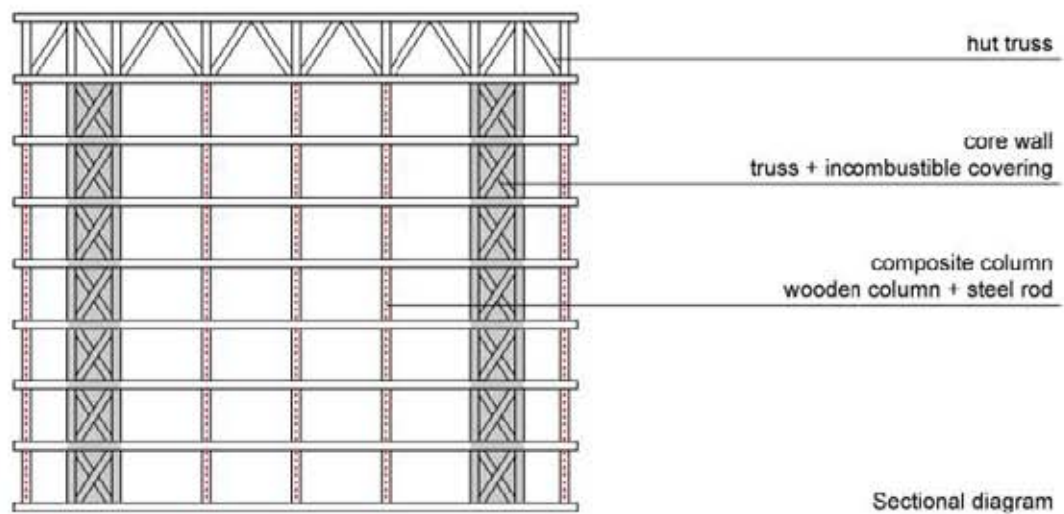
Diagram of structure: hut truss + core wall + composite column
